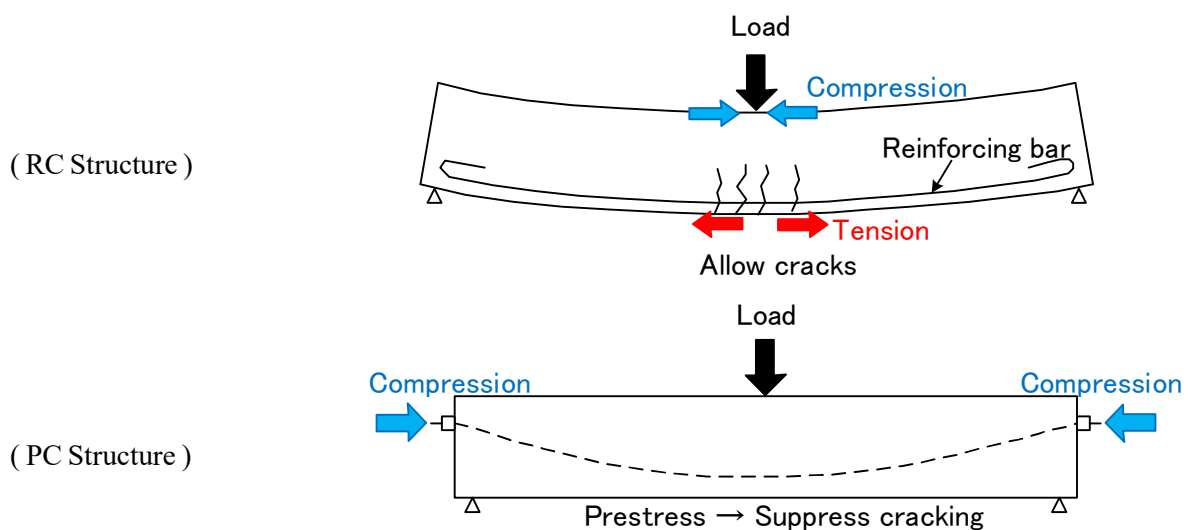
Structural System of Prestressed Concrete Box Girder Bridge
